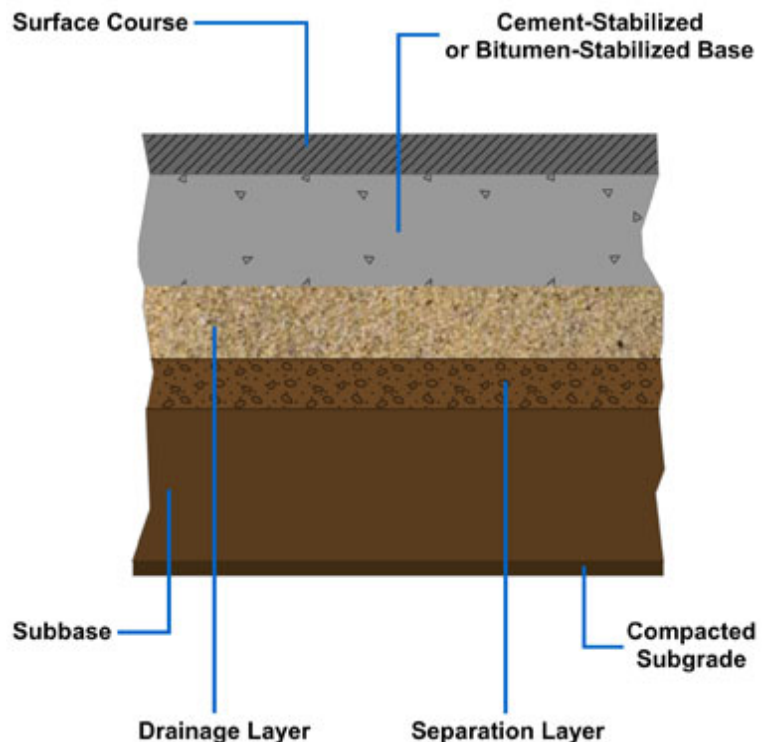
Typical all-bituminous concrete pavement.
